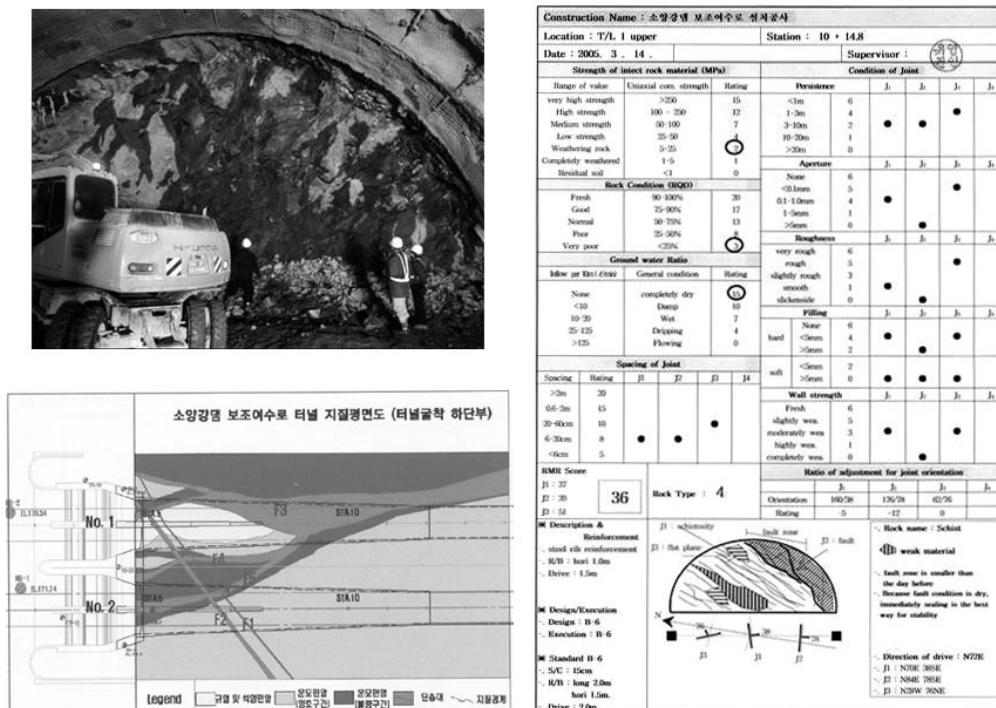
Tunnel face mapping during excavation and a comprehensive information sheet
